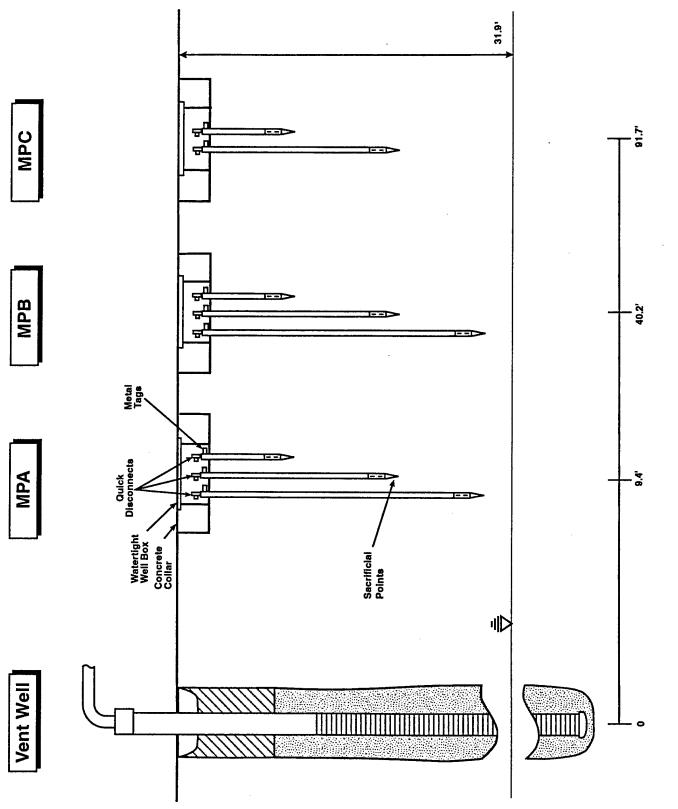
Cross Section of Vent Well and Monitoring Points at the Million Gallon Hill Site Showing Site Lithology and Construction Detail (not to scale)
